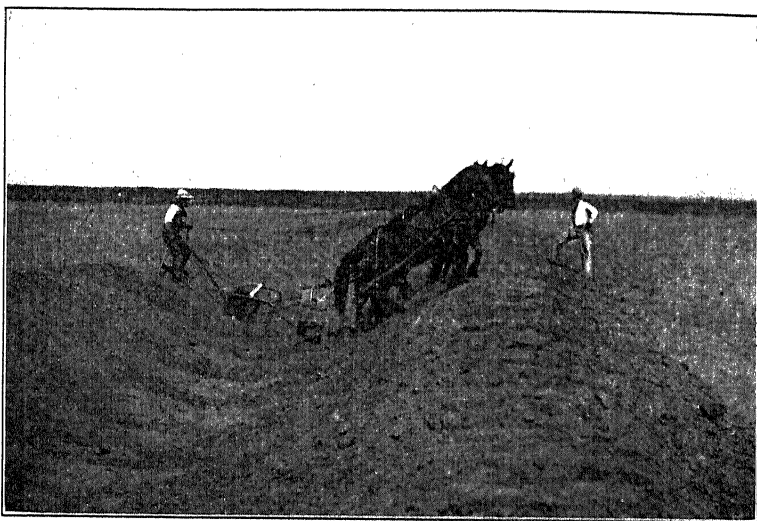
Constructing a farm ditch with a Fresno scraper.
